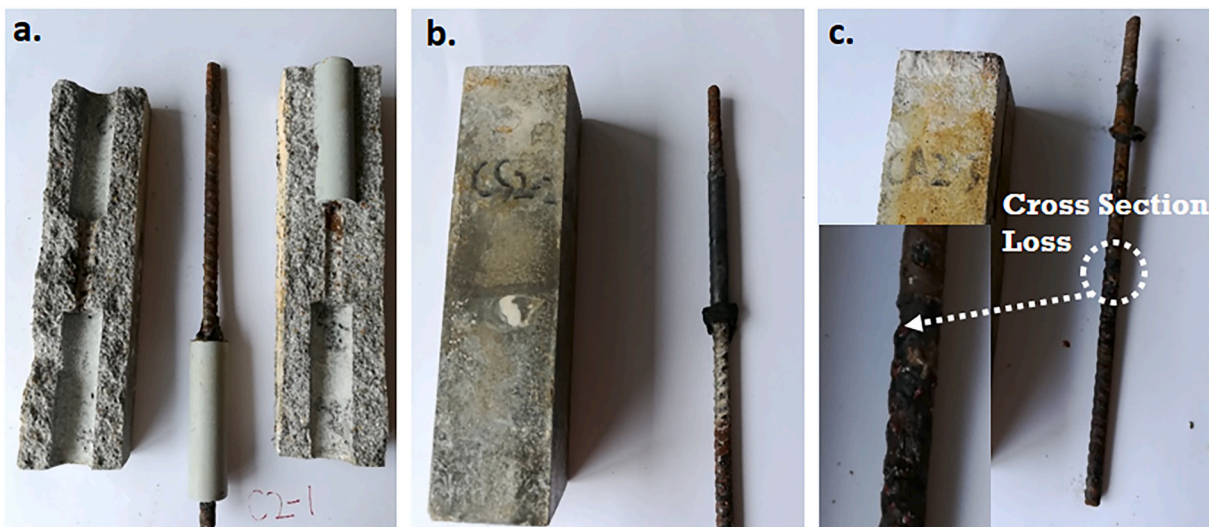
Specimens after pull-out: (a) C-28 d; (b) CS-28 d; (c) CA-28 d.
